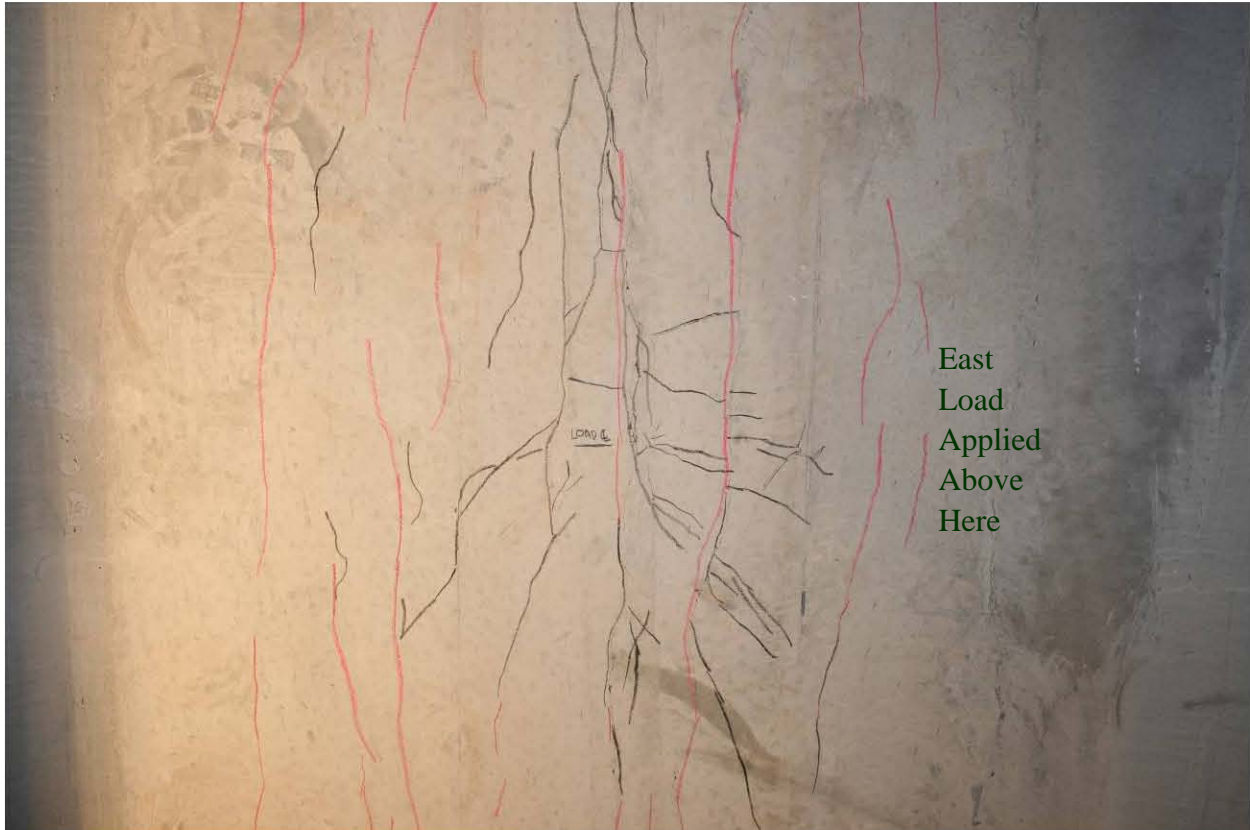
Photo. Under-deck cracking after conclusion of Test T1D.
